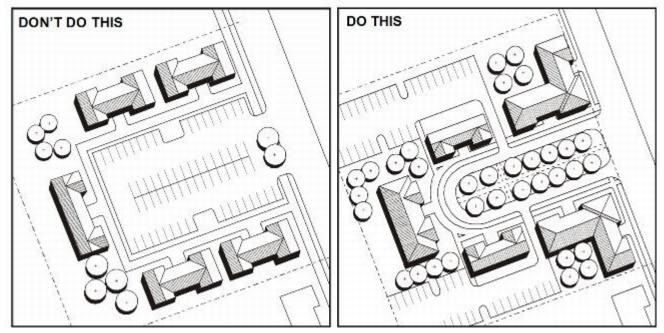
(E): Examples of breaking up parking and siting it behind buildings. Such development creates an attractive open space and avoids the impact of a large central parking lot.
